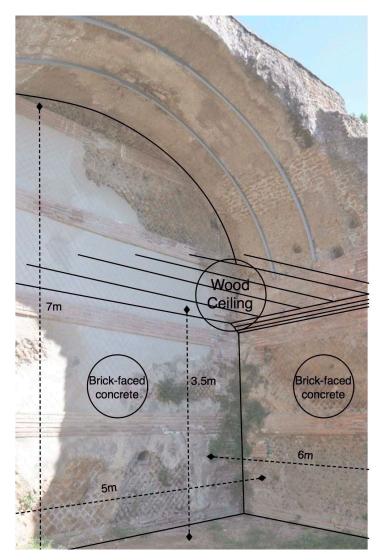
Reconstructed shop (Portico di Pio IX) with mezzanine elements. (Author)
